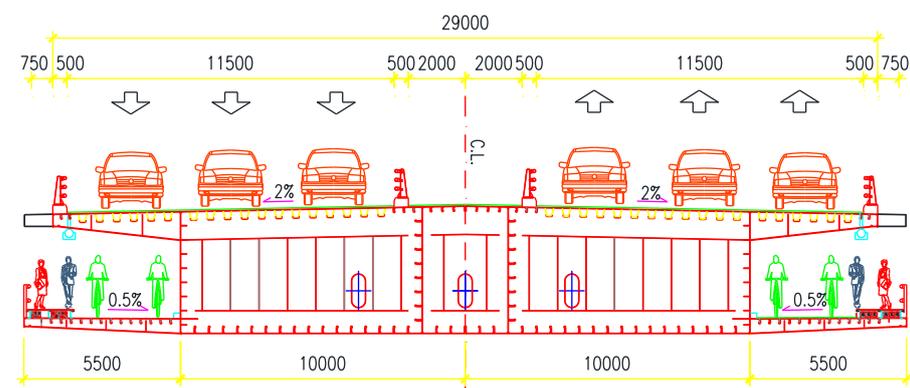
Cross-sectional layout of the Zhongxing Bridge (unit: mm)
